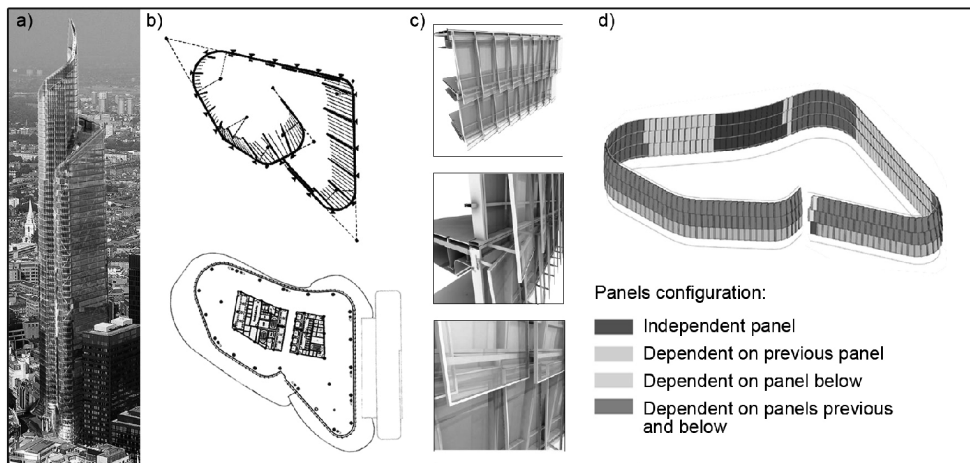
Bishopsgate Tower: a) a visualization; b) a diagram of the building geometry and a typical floor plan; c) a model of elevation – visualizations; d) a diagram of the elevation panels configuration
